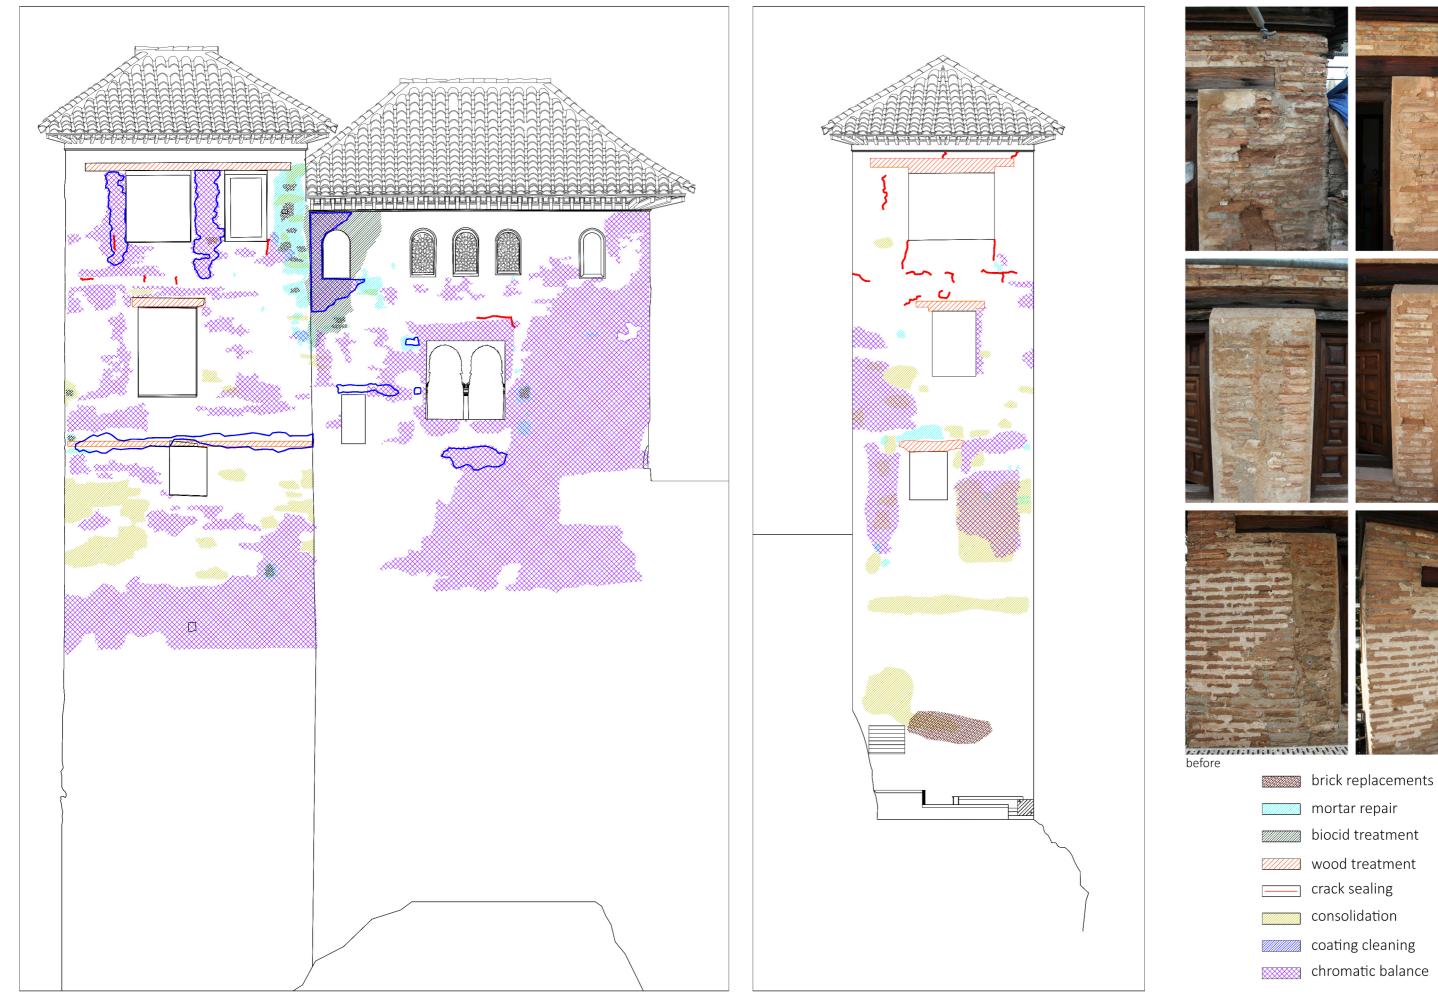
Interventions of the external brickwork walls. North-east and south-east elevations
